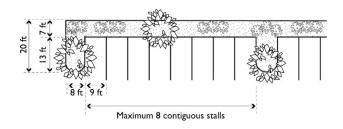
C.1: INTERIOR PARKING LOT LANDSCAPE ISLANDS
